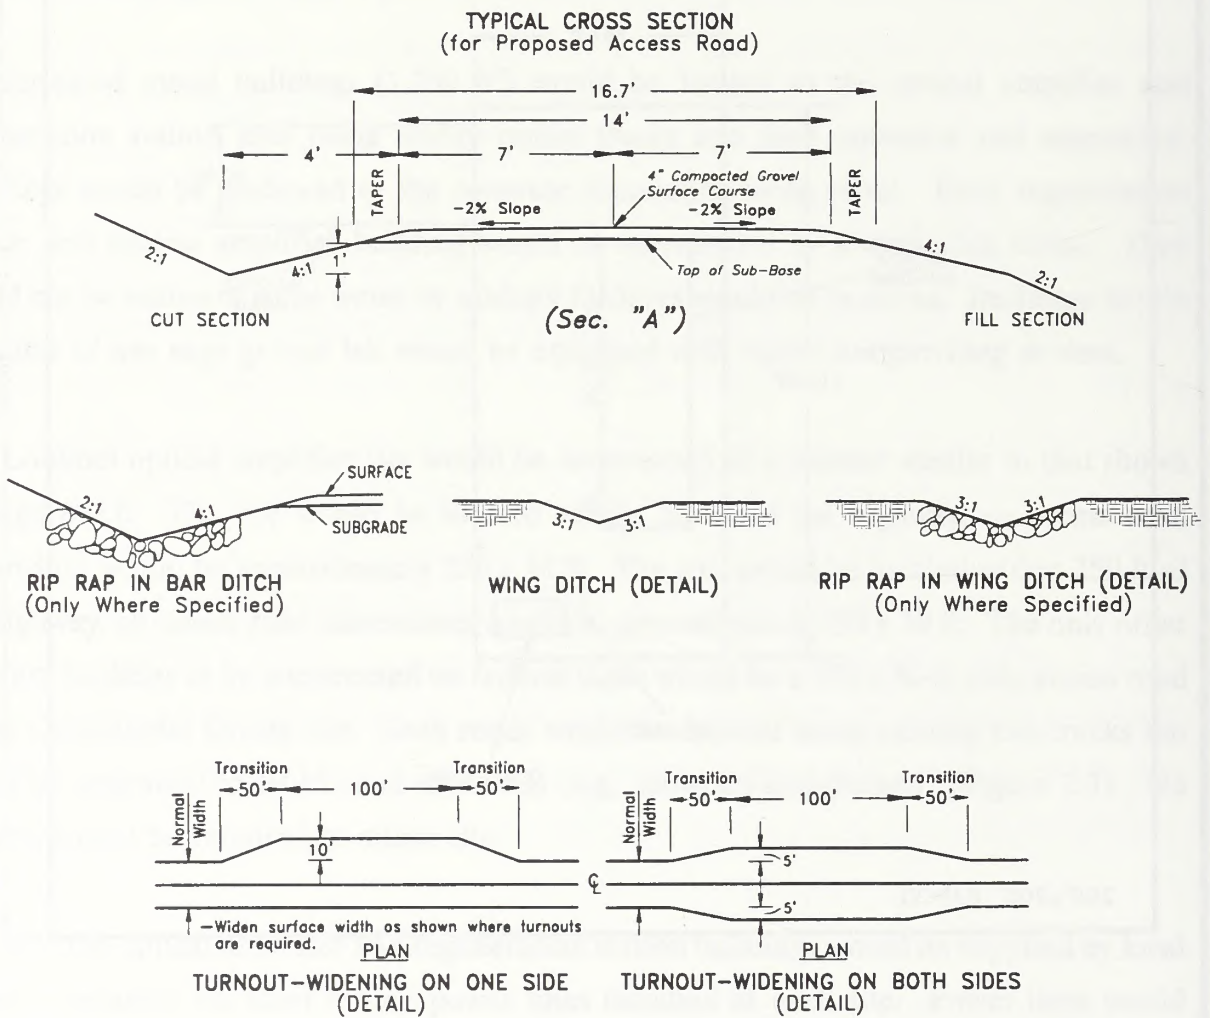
Typical Road Cross Section for Access Roads on BLM Lands.
